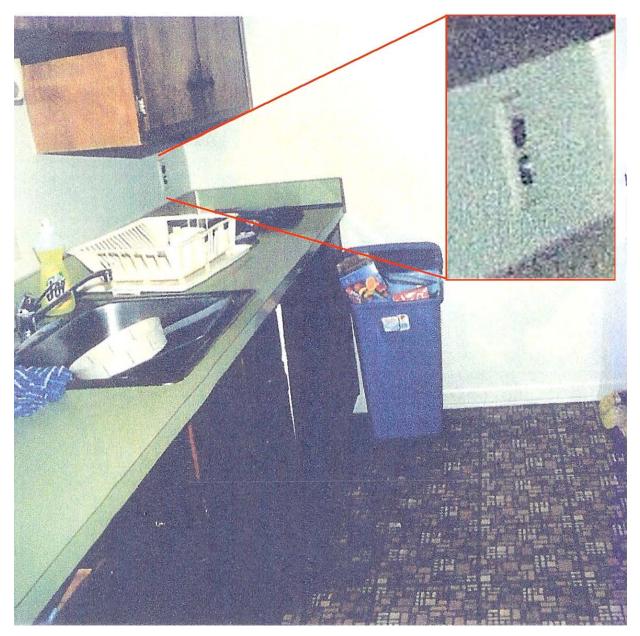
Outlet Repaired in Apartment Above Ledford Apartment
